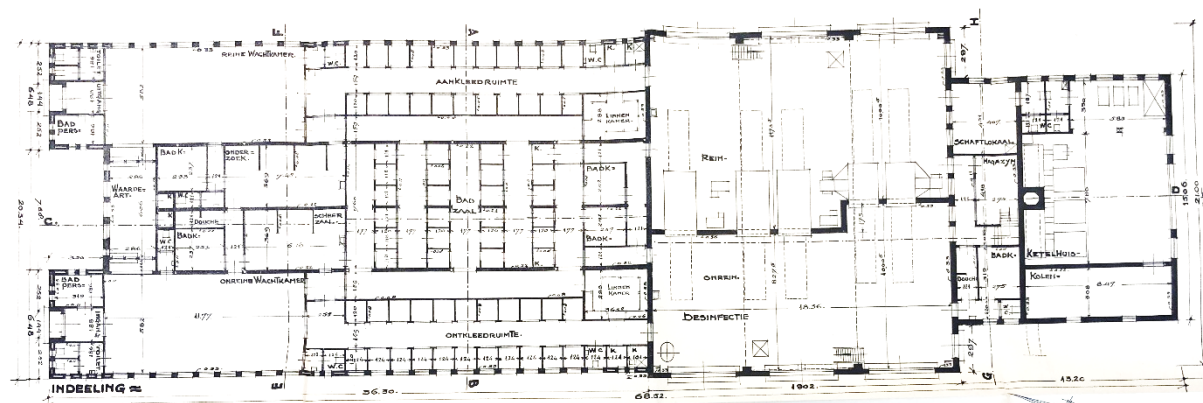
Final floor plan of Decontamination building (Stadsarchief Rotterdam)
